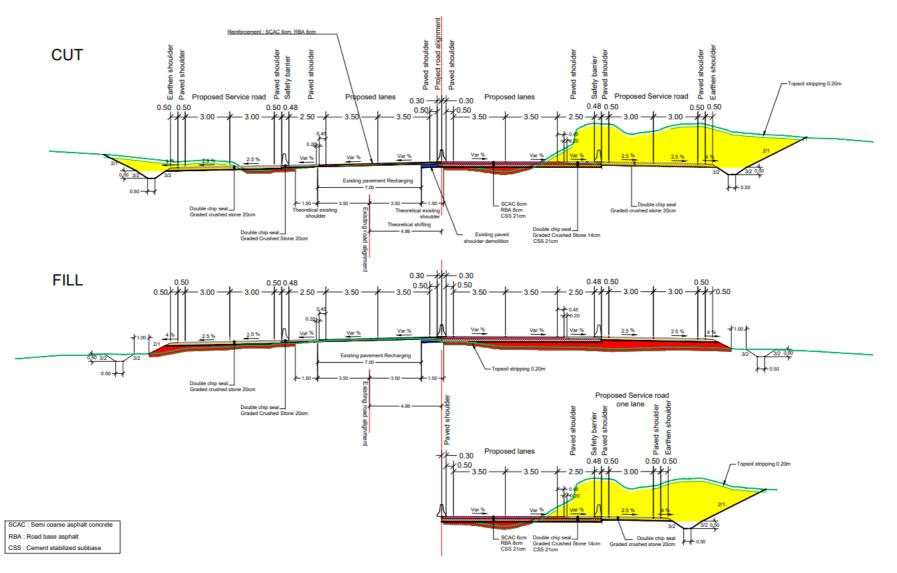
Typical Cross Section for Eccentric Widening of Existing 2-Lane Section to 4-Lane Divided Carriageway with Service Road in Rural Area and rolling terrain
